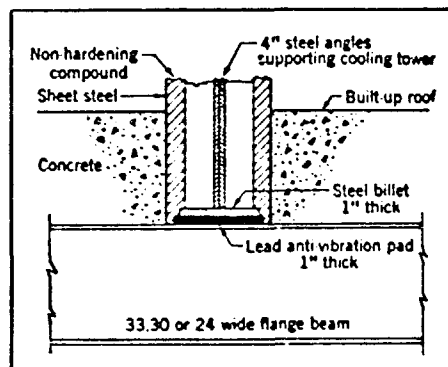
Pads are installed between the base of the cooling tower's supporting columns and the actual structural steel as shown in drawing.
